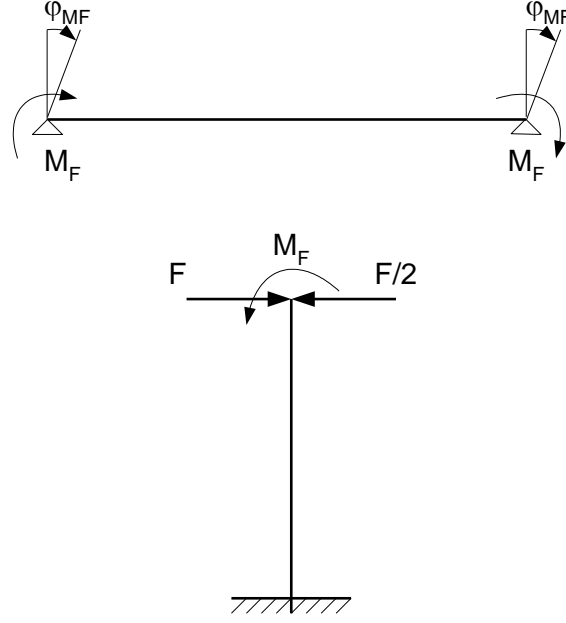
Angle deformations of the beam due to horizontal force F . Bending moment and horizontal forces acting on the columns in the case of the horizontal load F
